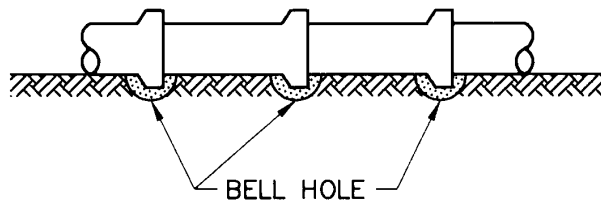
Excavation of Bell Holes for Uniform Support
